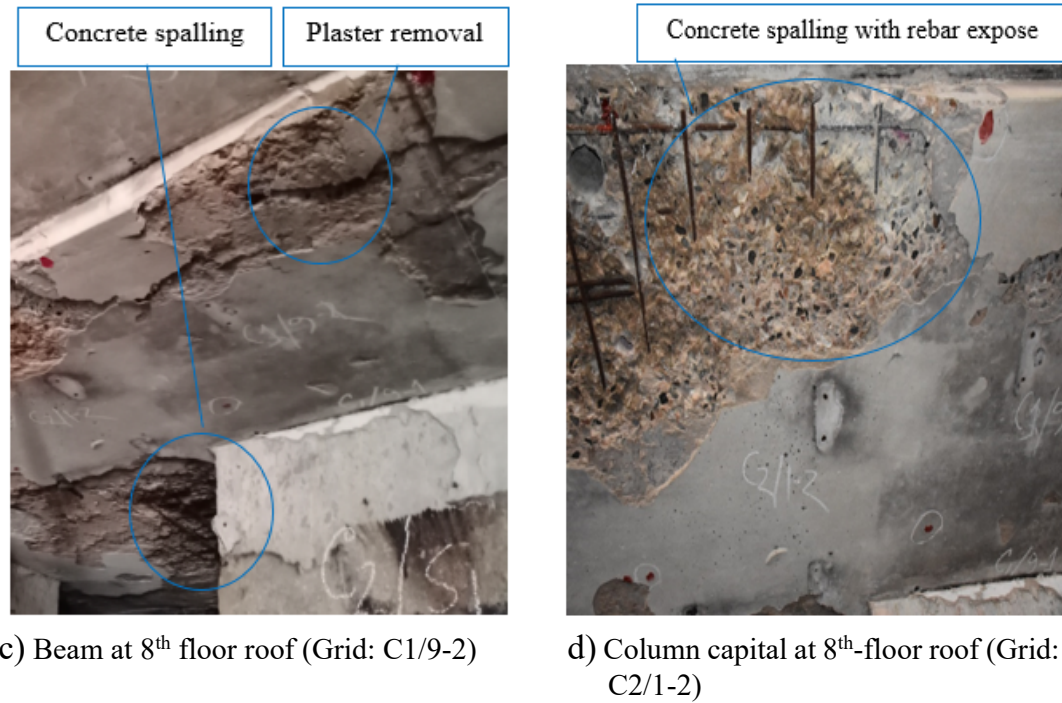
Some pictorial evidence of structural concrete damage.
